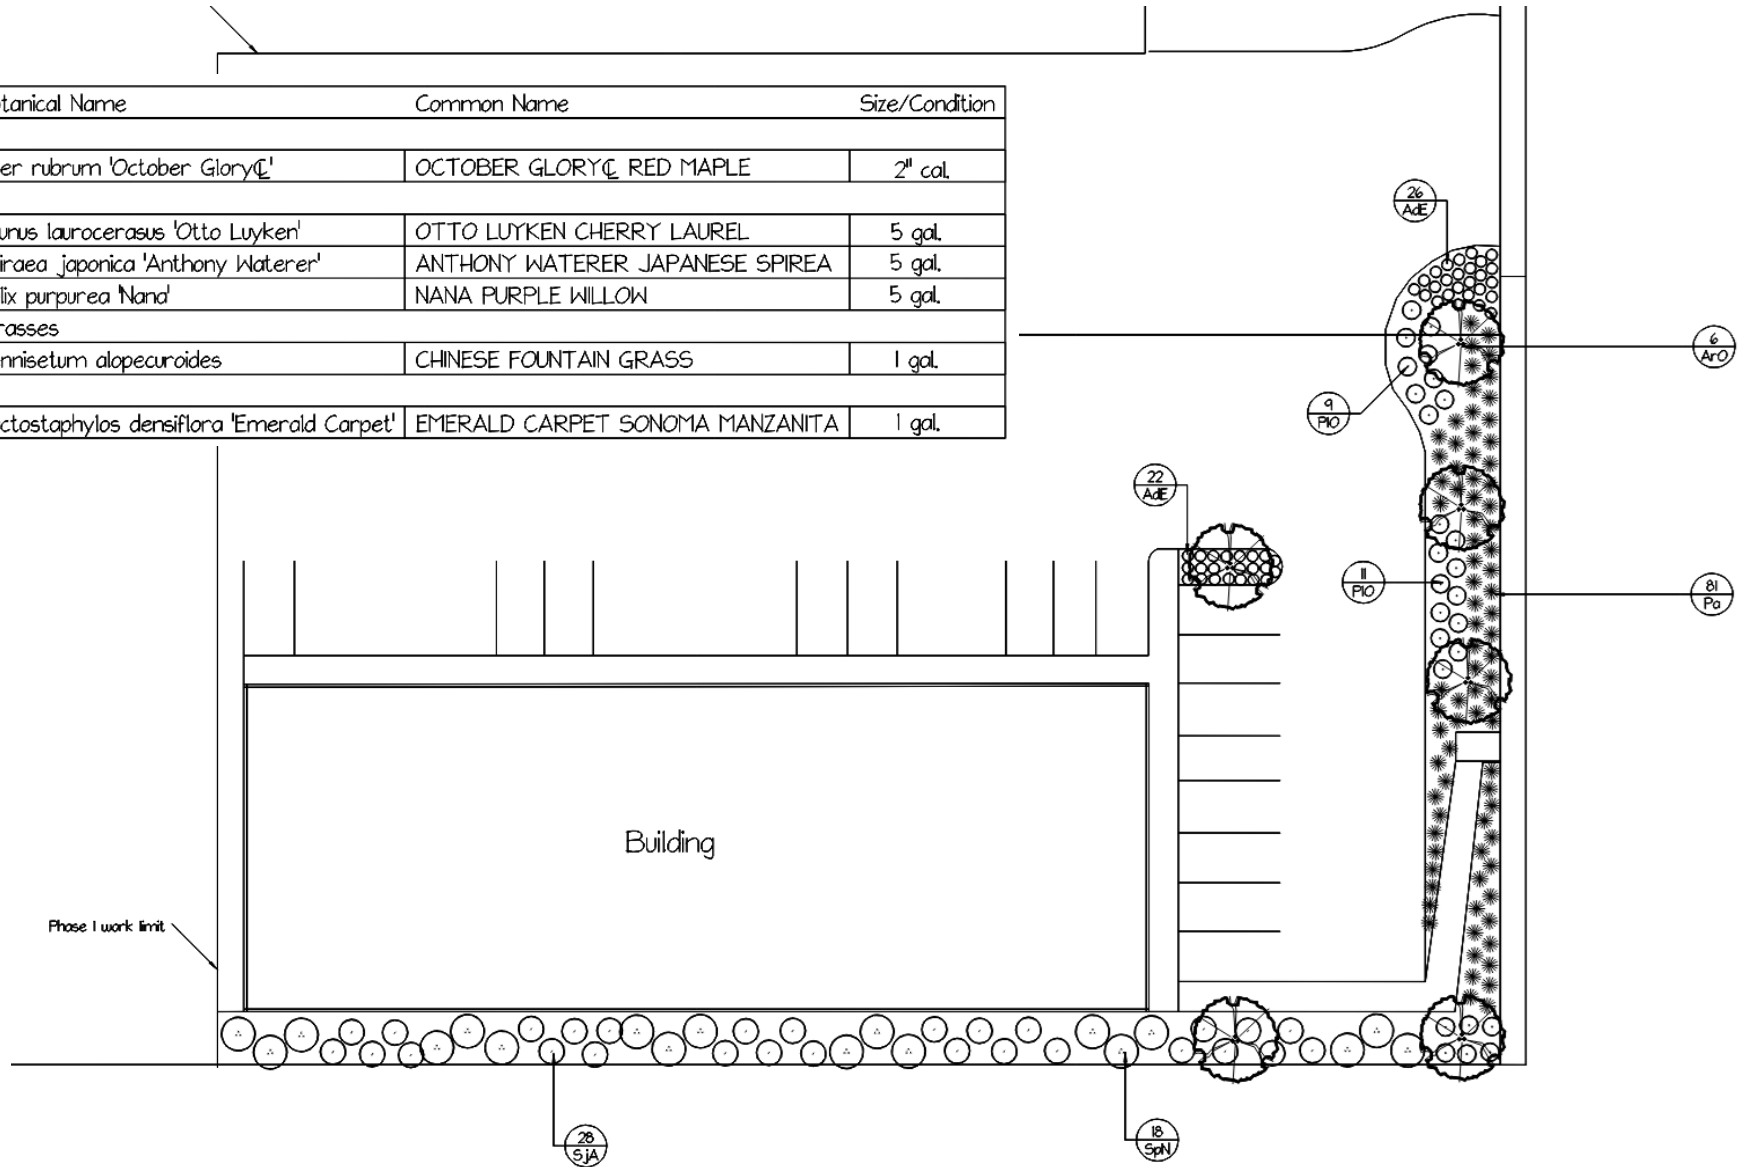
Landscape Plan – Proposed Landscaped Areas Only
